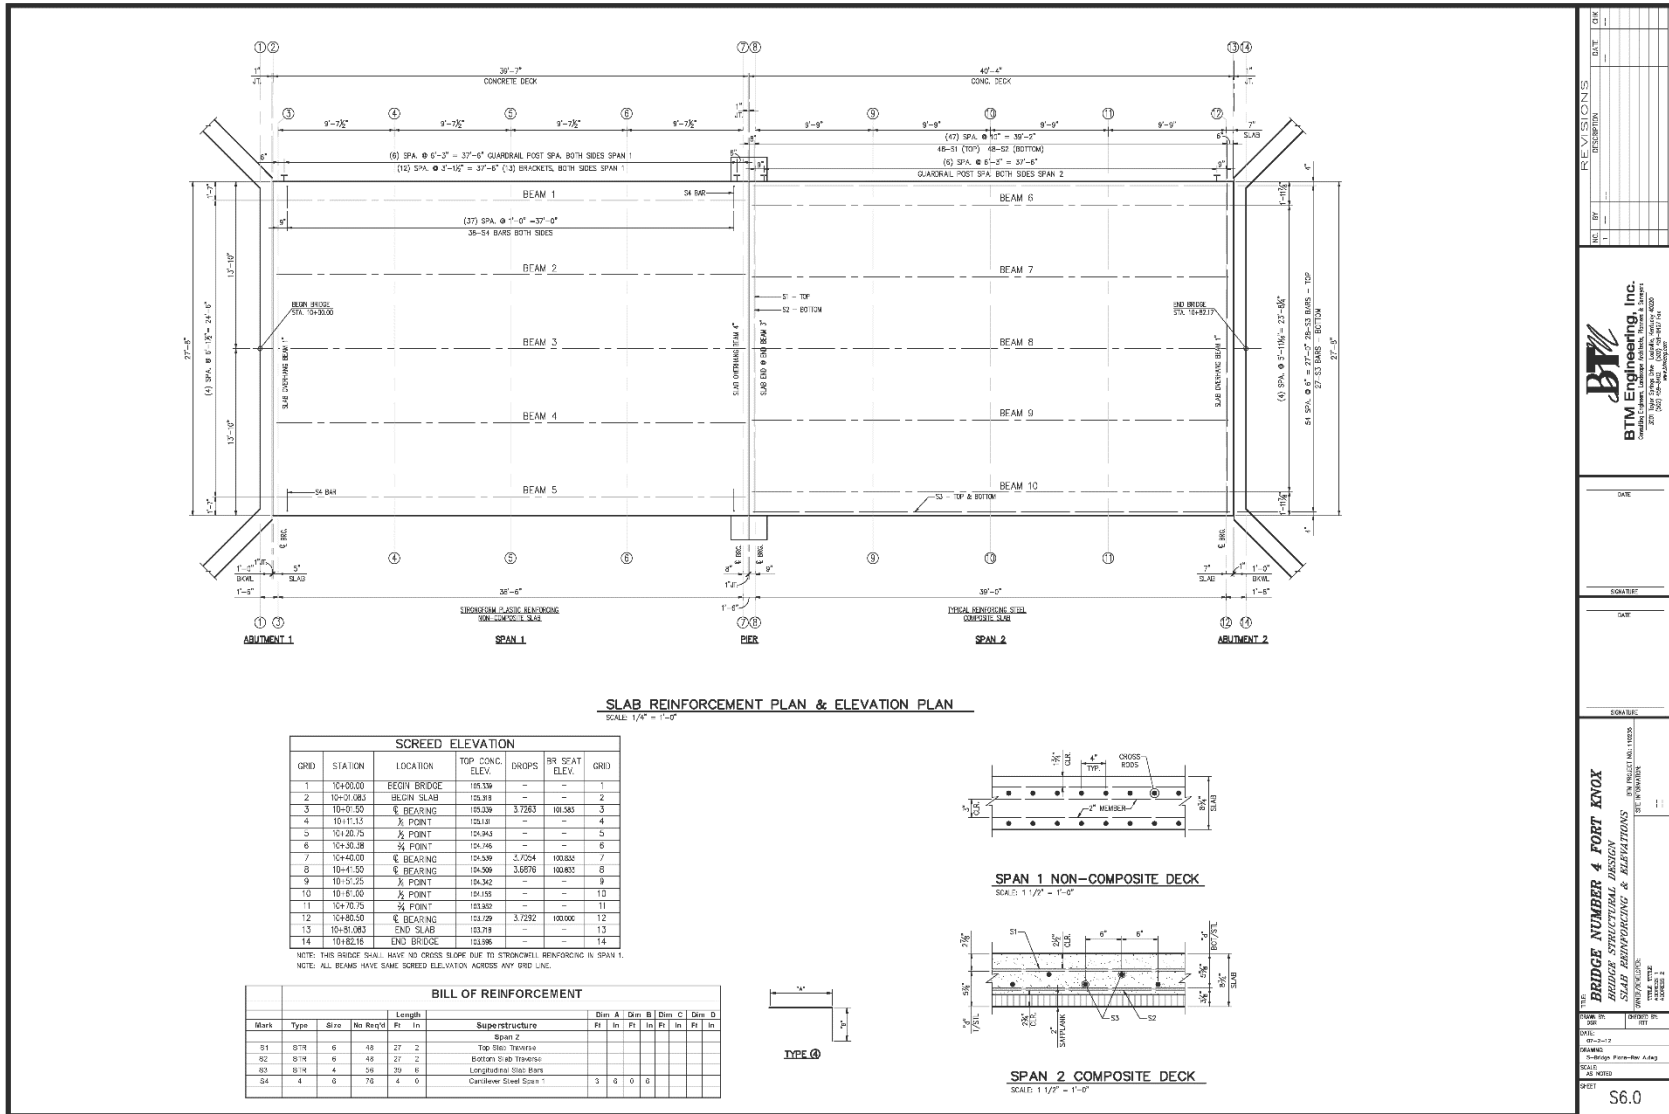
Engineer drawings for various design components on both spans of Bridge No. 4 at Fort Knox.
